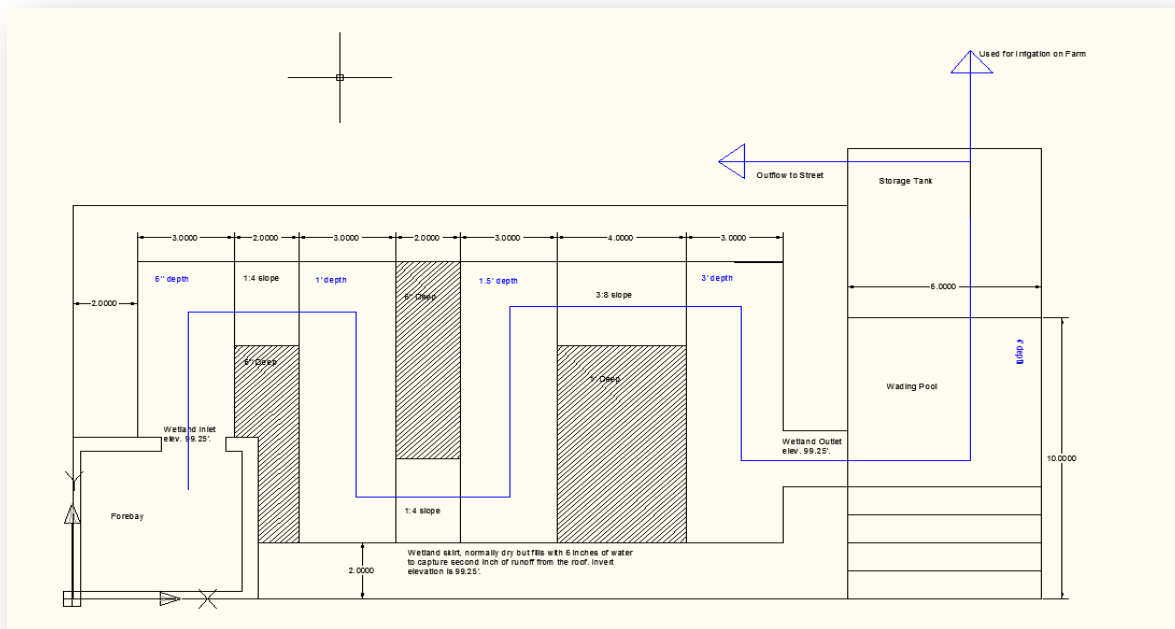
Plan view of system treatment area including 125 ft² forebay inside of a 336 ft² wetland, 60 ft² pond, and 2000 gallon underground storage cistern
